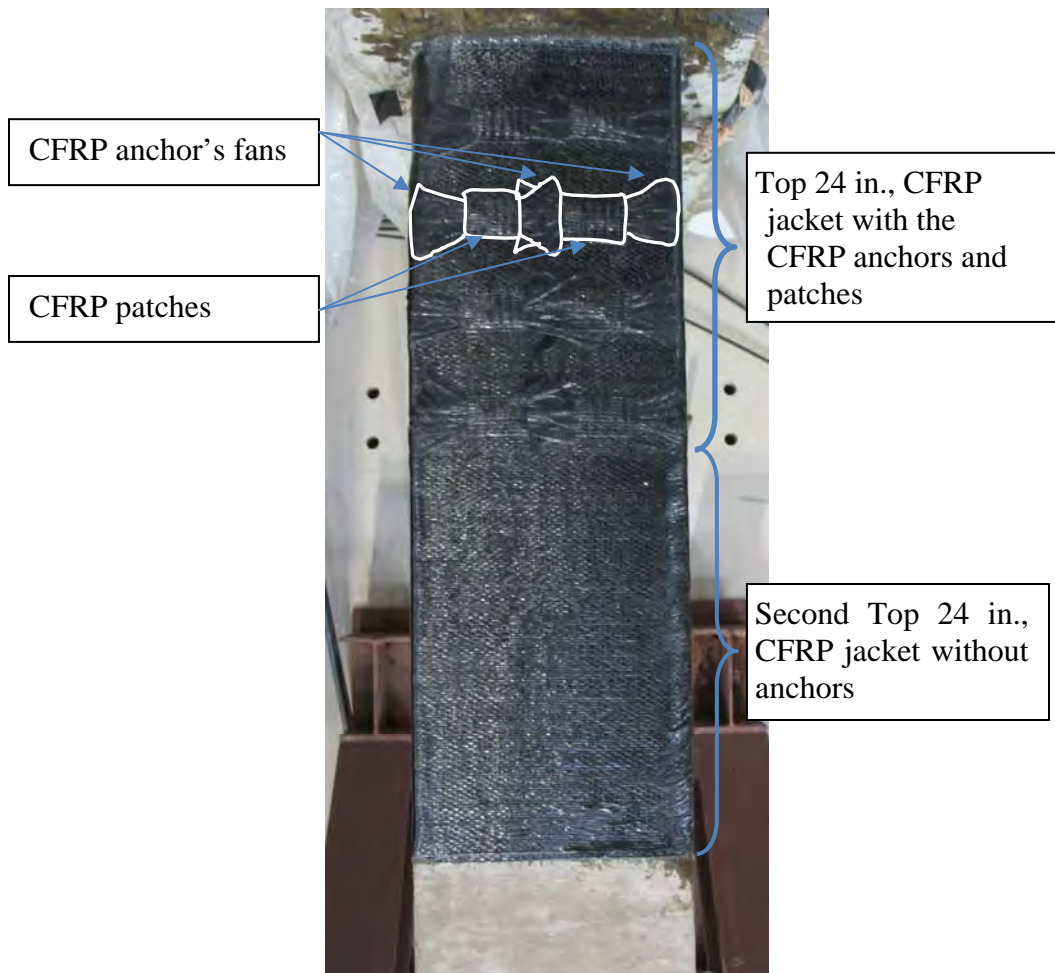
Top of column after installation of CFRP sheets and anchors.
